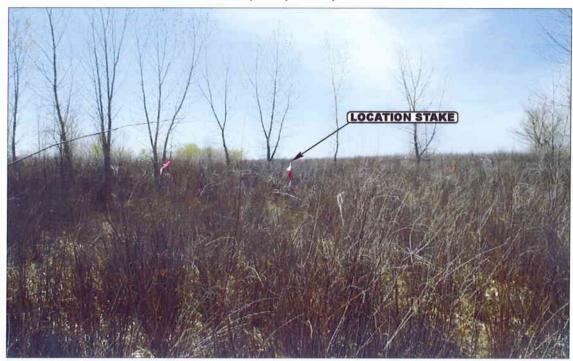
PHOTO: VIEW FROM CORNER 45-TO LOCATION STAKE
